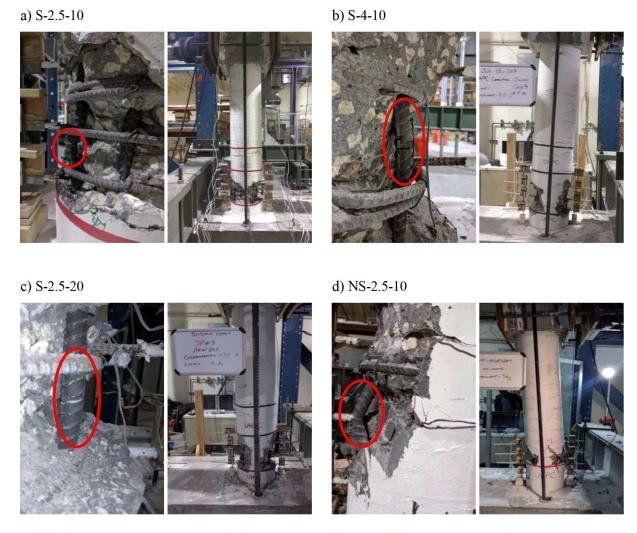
Failure pattern, longitudinal rebar fracture and location of the plastic hinge in the specimens.
